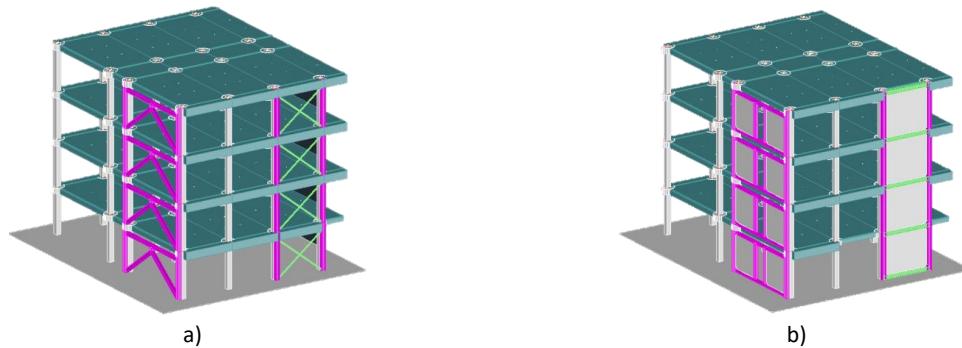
Structural upgrade of the existing frame building (detail): a) strengthening with EB and CB; b) strengthening with SPSW.
